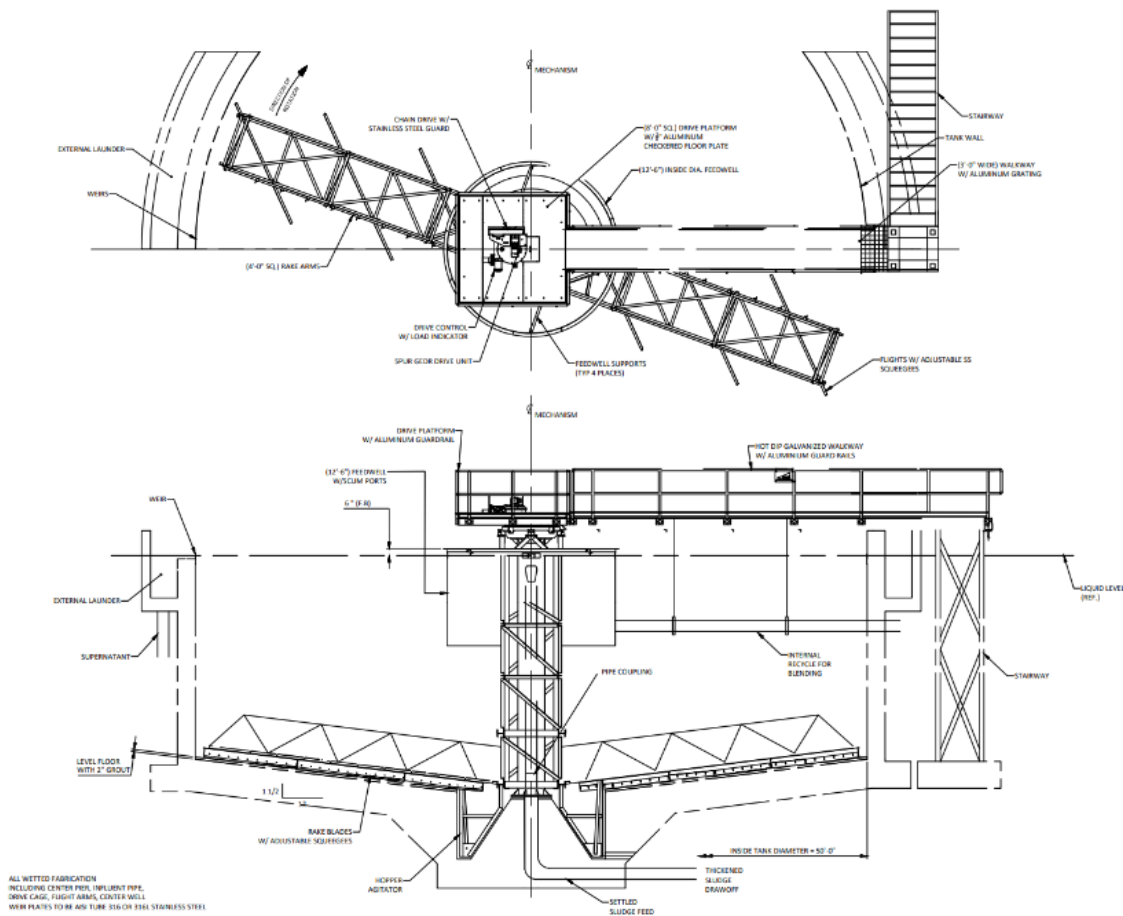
Plan and Elevation of Proposed Gravity Thickener
